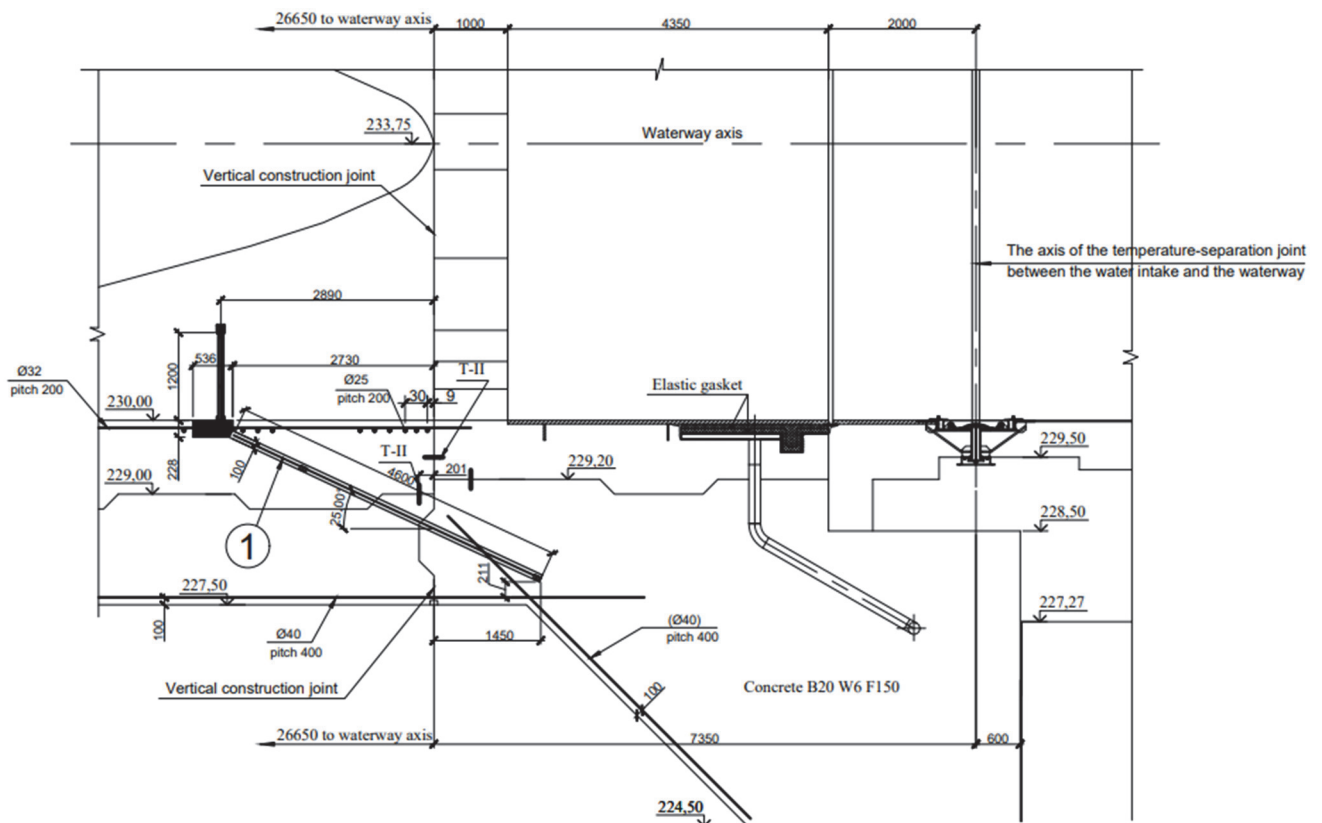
Scheme of strengthening the bottom section of the foundation slab with inclined rods (anchors):
